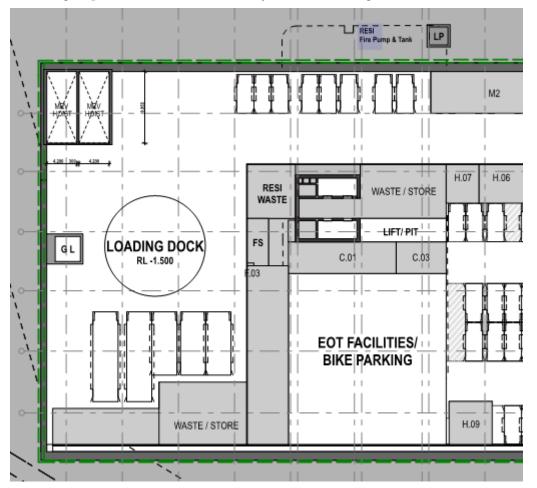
Basement Level 1 Loading Dock Indicative Concept Design
